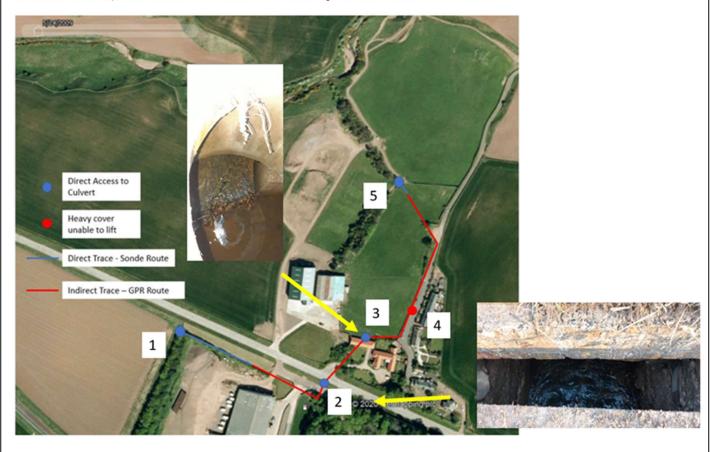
Old A1 / Skateraw culvert entry (900mm concrete pipe)
